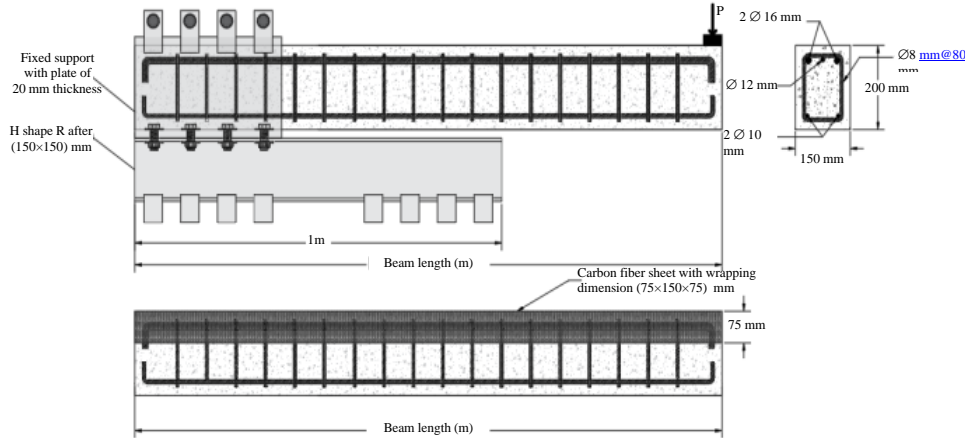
Reinforced concrete cantilever beam details (in general length) and fixed steel support setup
